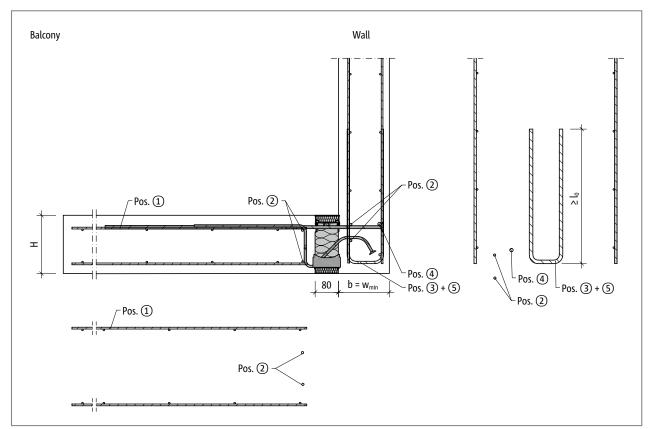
Schöck Isokorb® T type K-U: On-site reinforcement for wall connection with minimum structural element dimension (w_{exist}= w_{min})
